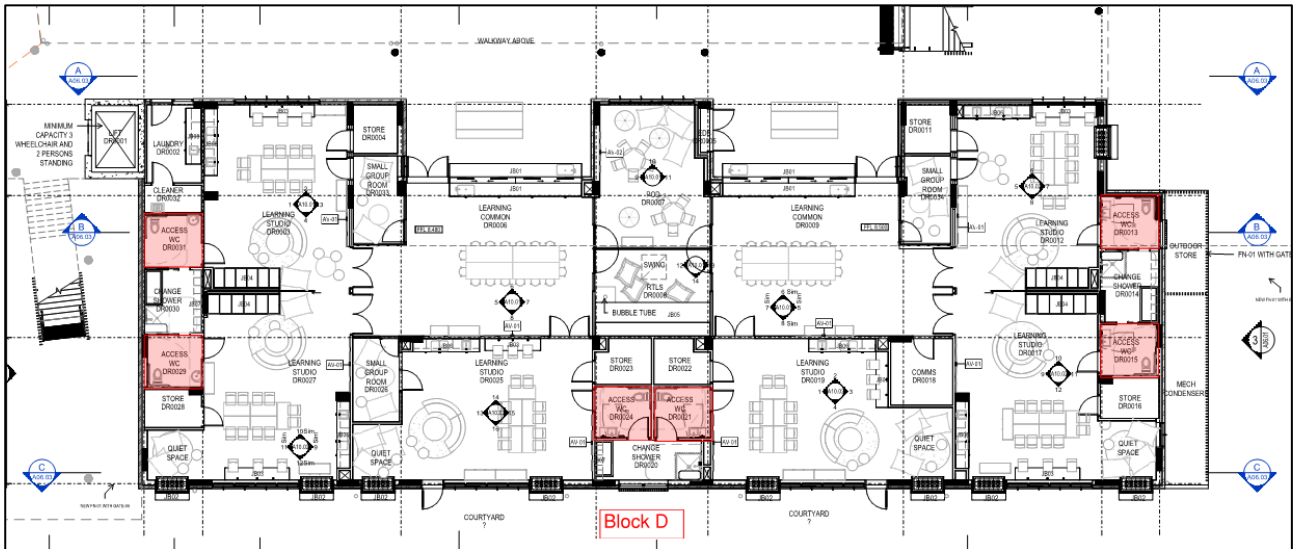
Block D: Ground Floor Student sanitary facilities in the classrooms
